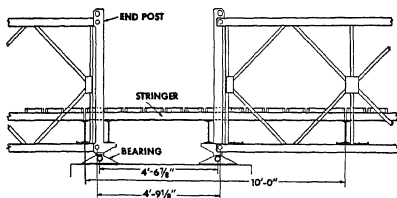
Two spans supported on a common pier. Gap of 5 feet left between ends of spans is bridged by offsetting stringers.
